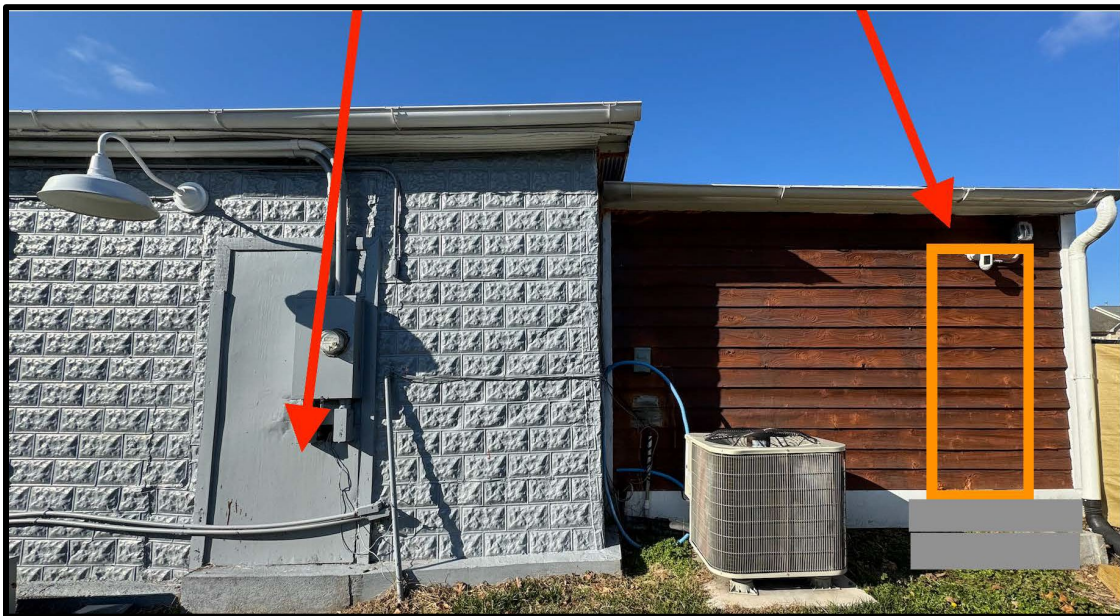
The applicants provided this diagram to show the existing doorway opening on the right elevation, left, and the proposed location for the new doorway. Stone pavers will be placed at the base of the new doorway. The existing doorway has long been enclosed and an electric meter has been installed on it.
